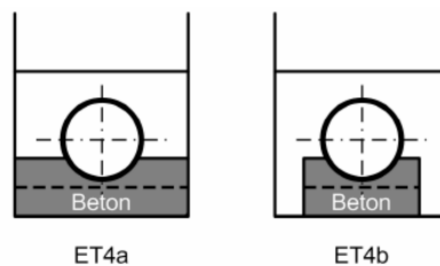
ET4 (embedding type 4, including subtypes a) and b): The pipe is embedded on a concrete bedding. This embedding case is not permissible for flexible pipes [7]!
